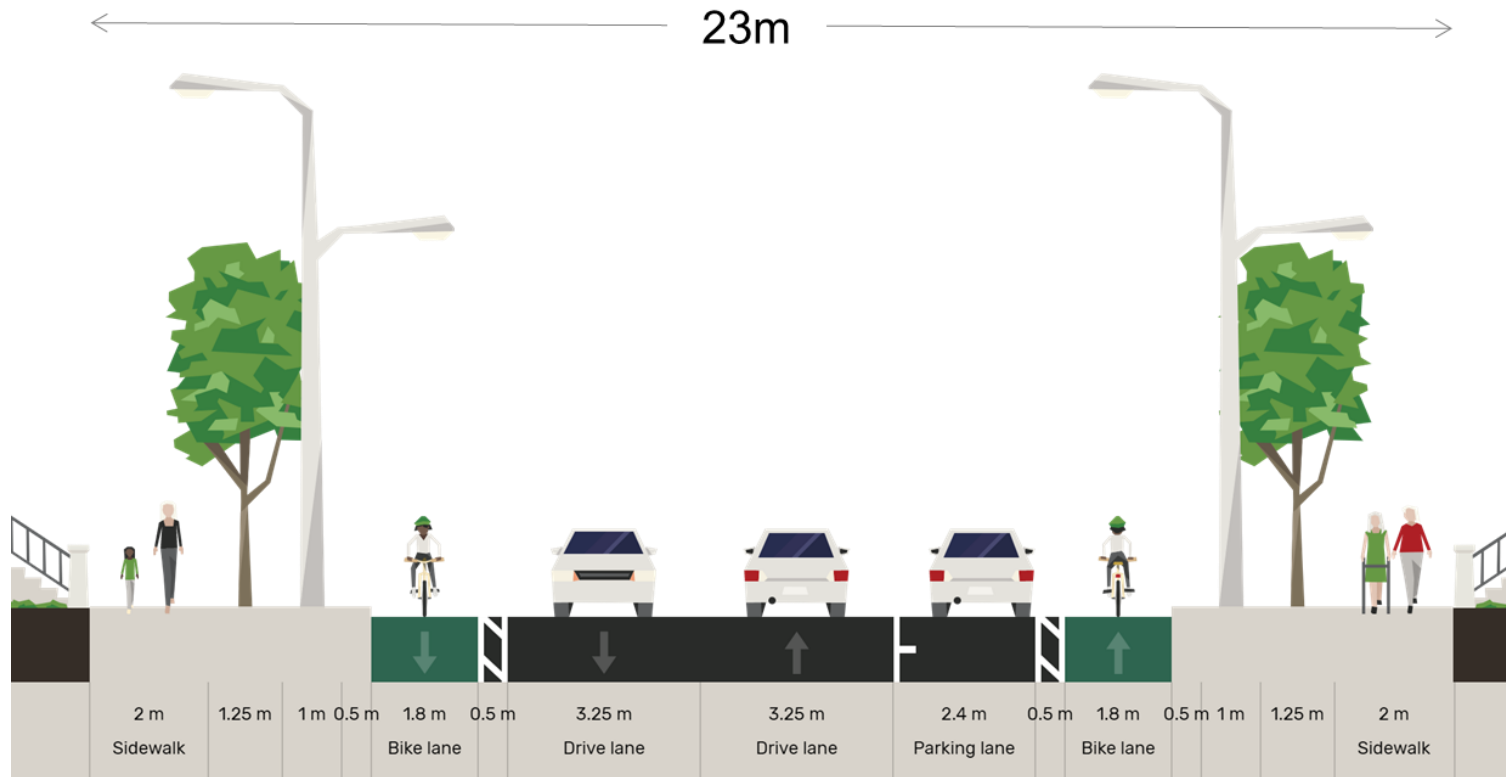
Conceptual Typical Cross Section for Collector Road
